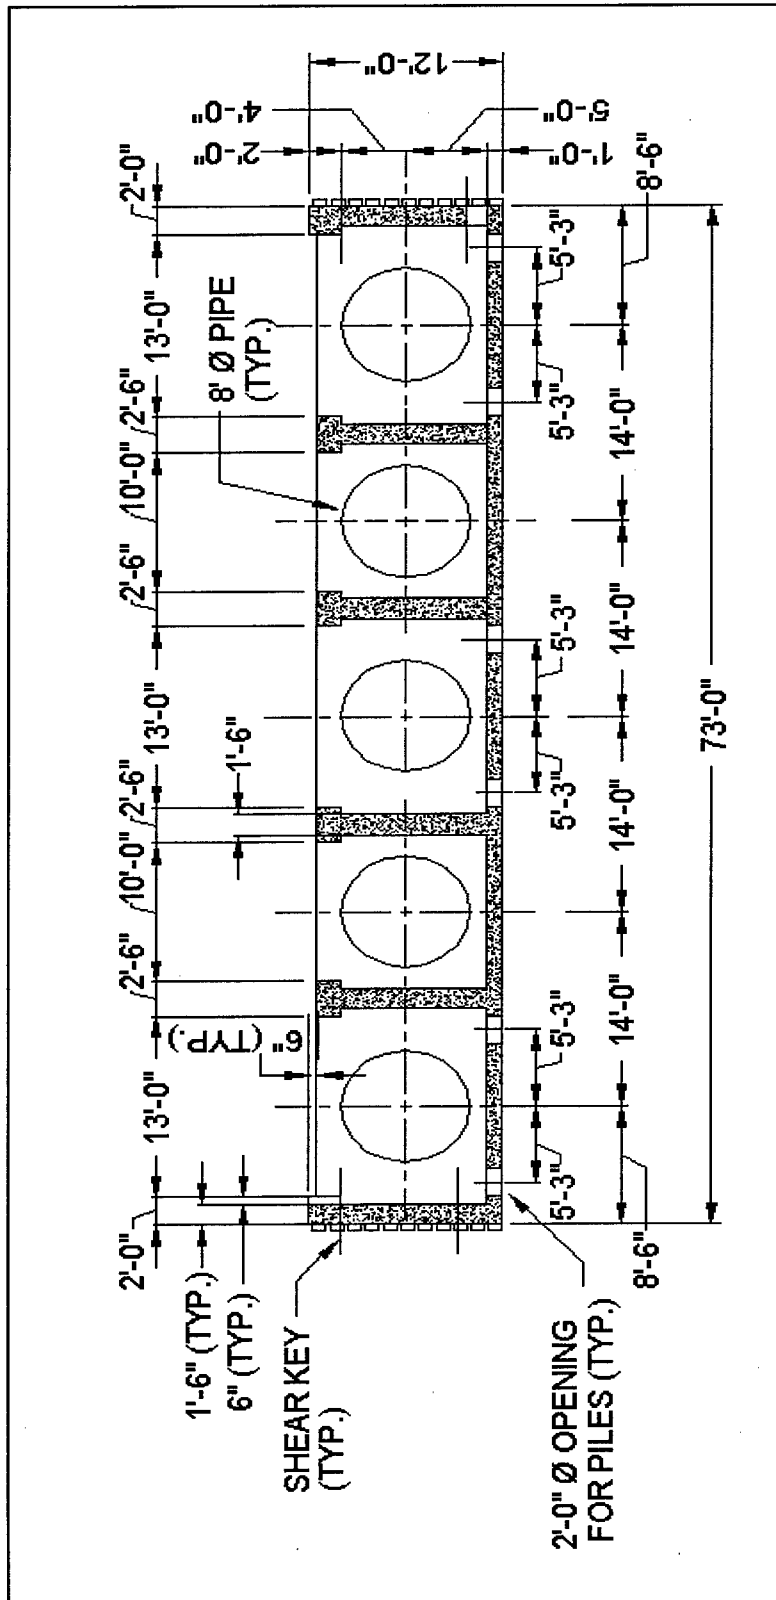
Plan 4, section through slab/culvert precast structural floor system
